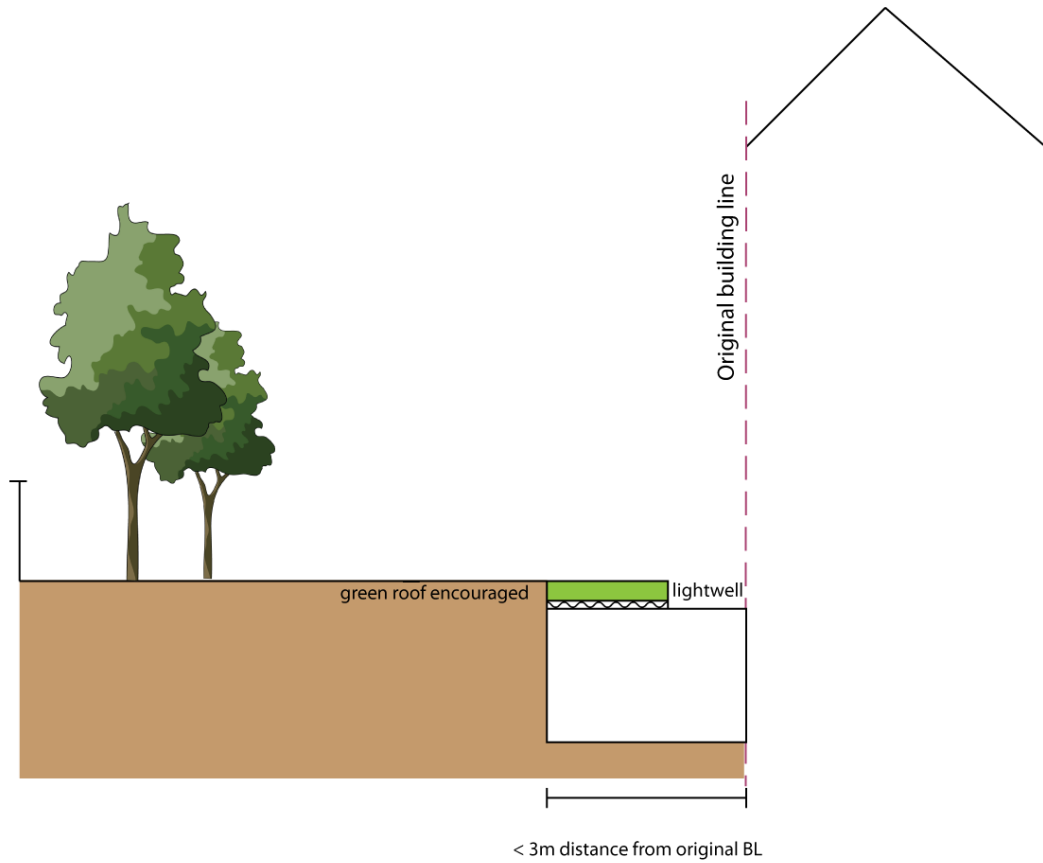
Diagram showing depth of soil above a basement less than 3m from the original rear wall, with lightwell and greenroof.
